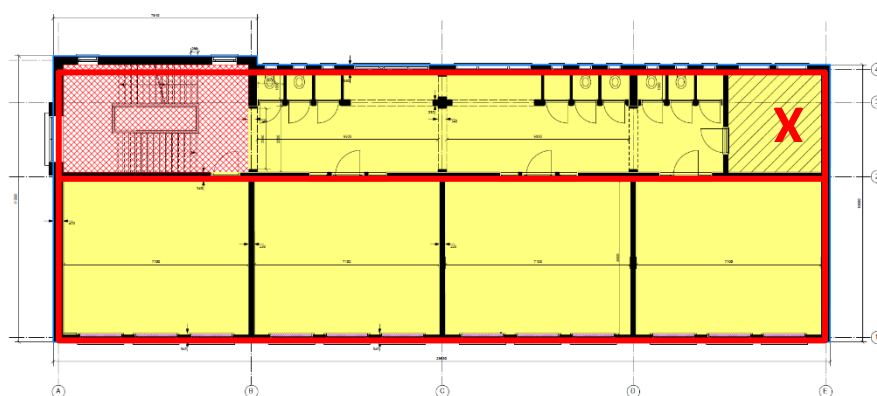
Floor plan of the previously 'Gewoon Lagere School'
